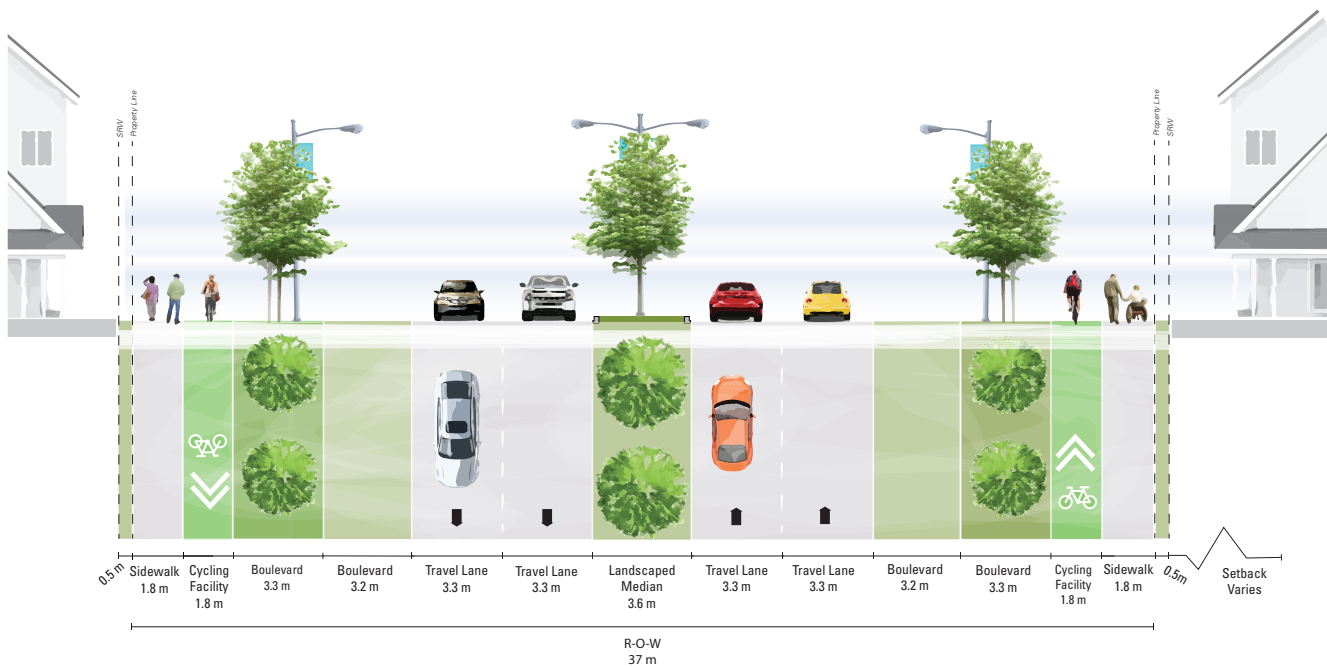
Arterial - 24 Avenue Interim 4 Travel Lanes (37 m Cross-section)
